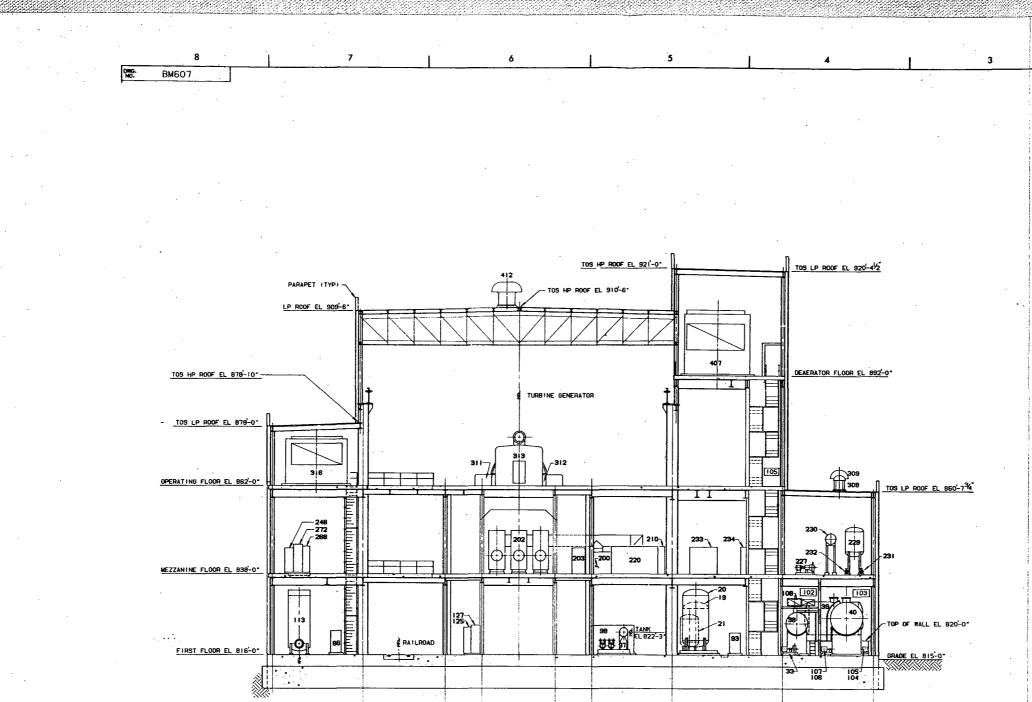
General Arrangement Turbine Generator Building Section C-C
